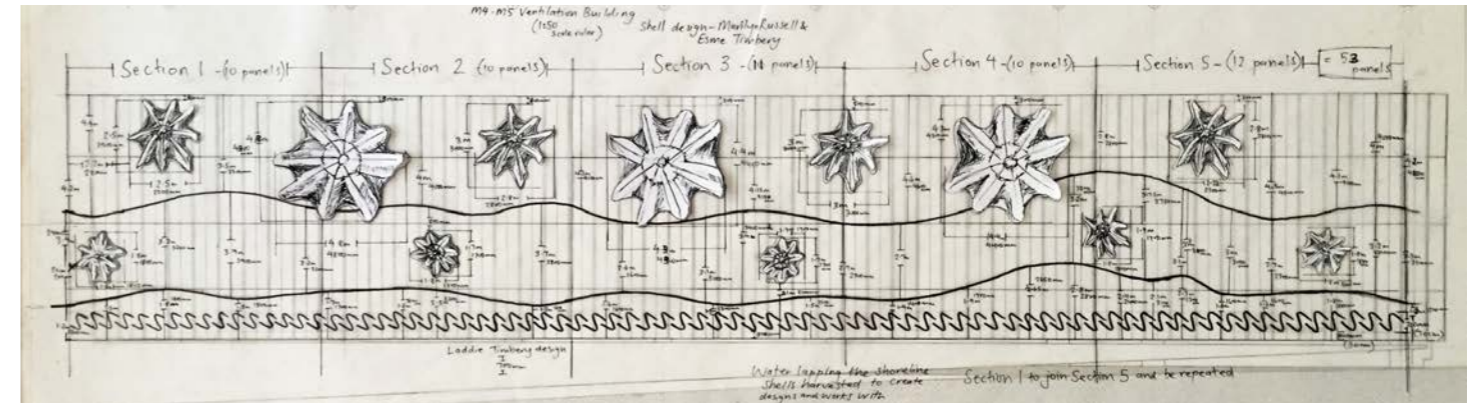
Original artist sketch over Campbell Road ventilation facility northern elevation
